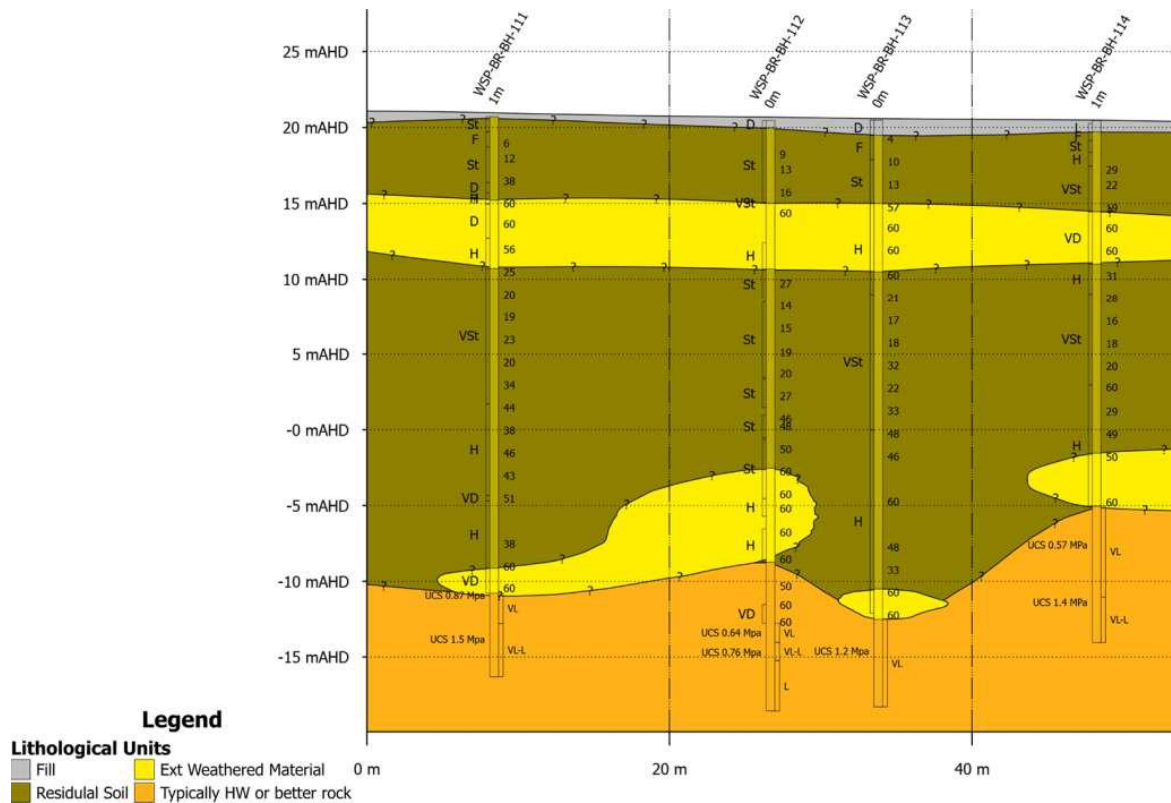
Inferred geological section through a bridge abutment from Leapfrog.
